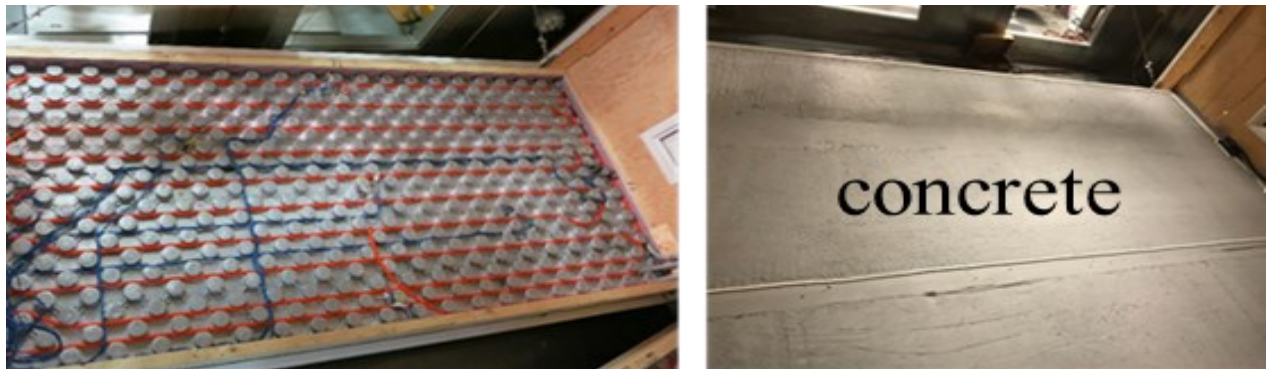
Radiant floor before (left) and after (right) pouring the concrete
